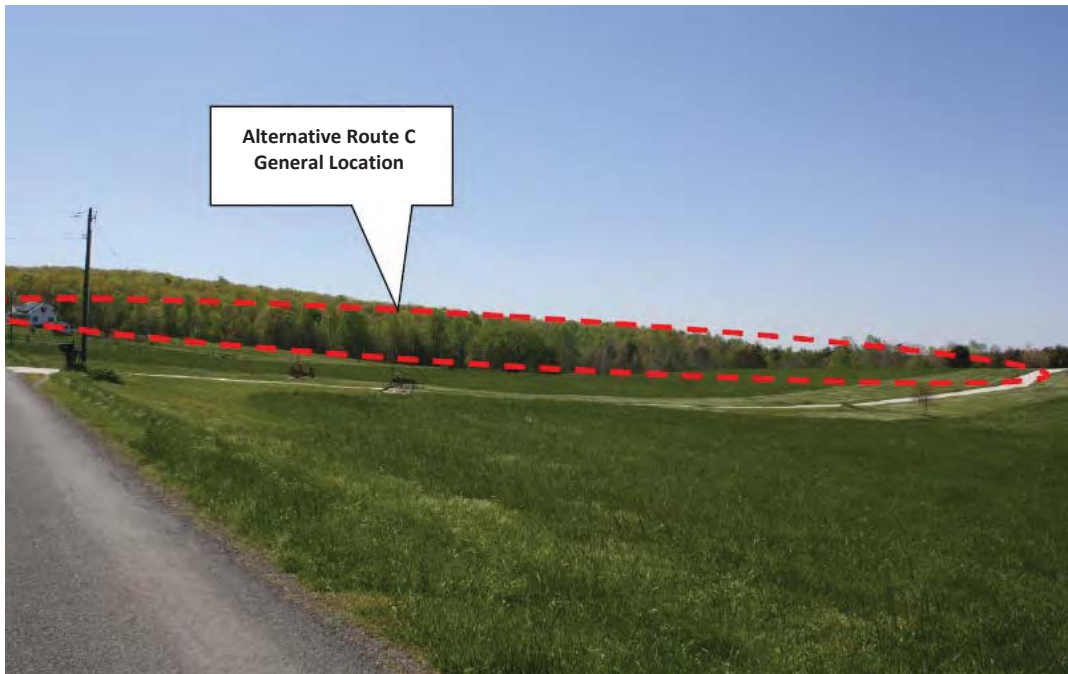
Tin Top House Facing Southwest, Alternative Route C
